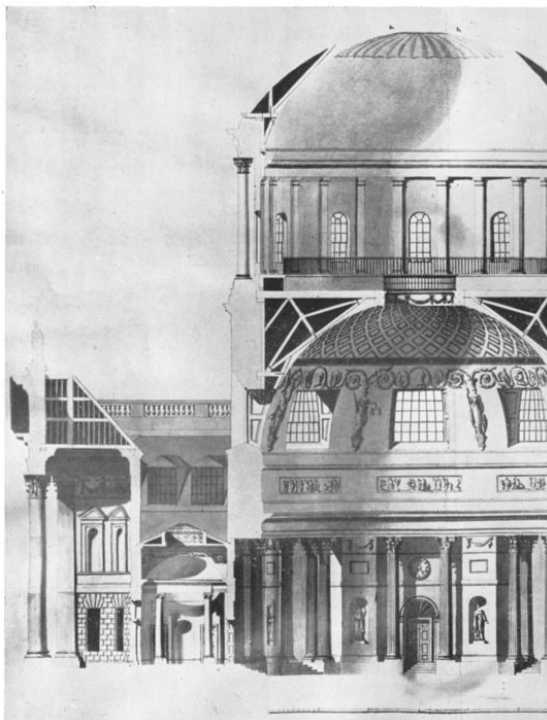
Historical Section through Rotunda. Note Upper Dome and Upper Floor both Originally Timber
